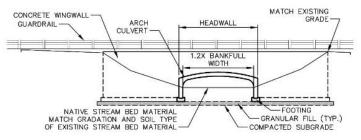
Typical detail of an open arch culvert designed to meet the MA Stream Crossing Standards 2018. Red a
